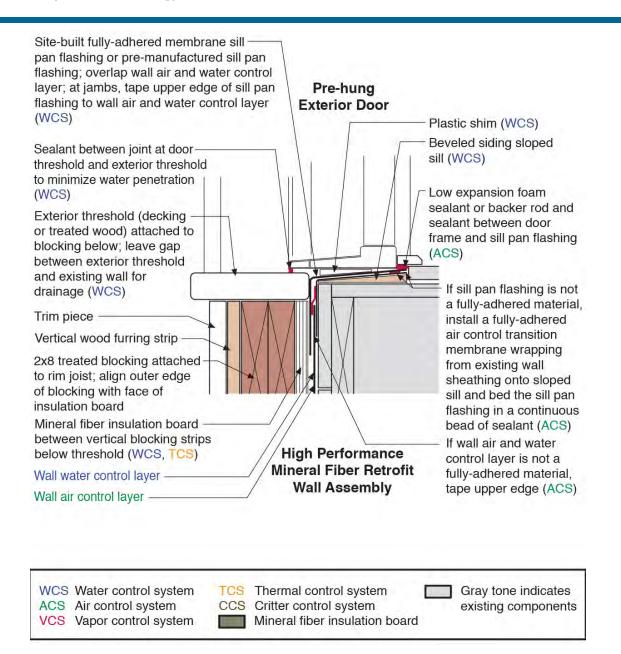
Schematic detail for door sill of new door or reinstalled door in a high performance mineral fiber retrofit wall assembly
